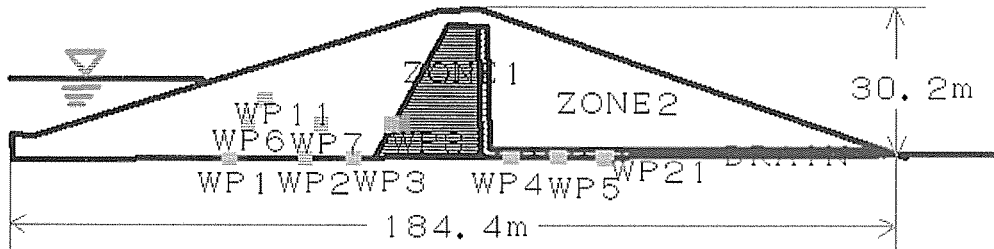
The fill-type dam's standard cross section and underground instrument's positions.
